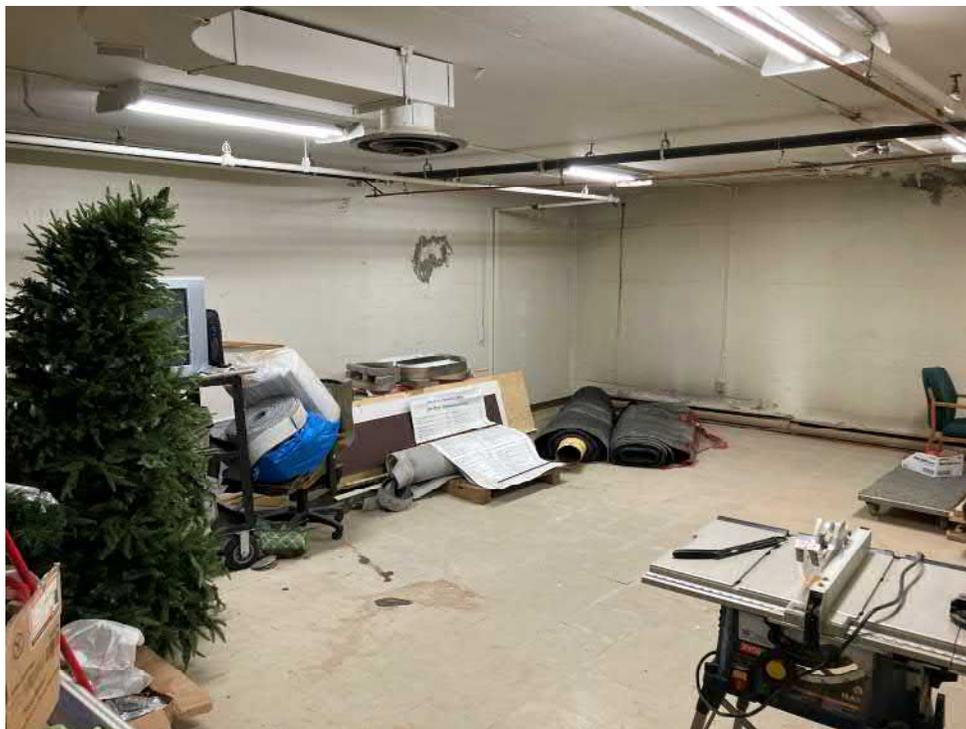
Basement storage room at northeast corner of building, facing northeast.
